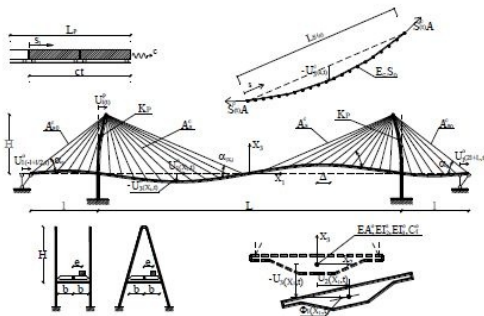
Cable stayed bridge scheme: bridge kinematic, pylon, girder and cable system characteristics.
